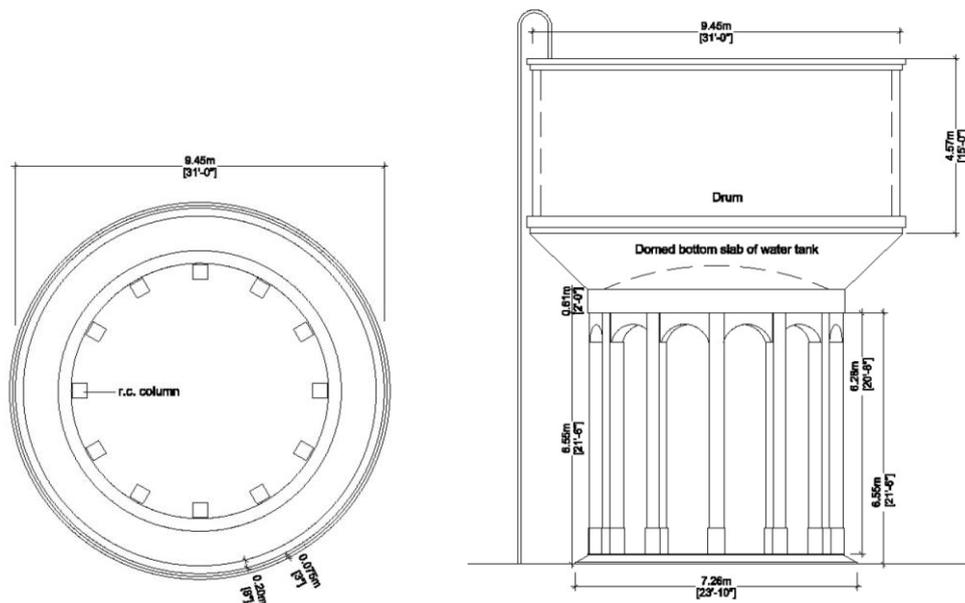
Reinforced Concrete Water Tower (Plan and Elevation)
